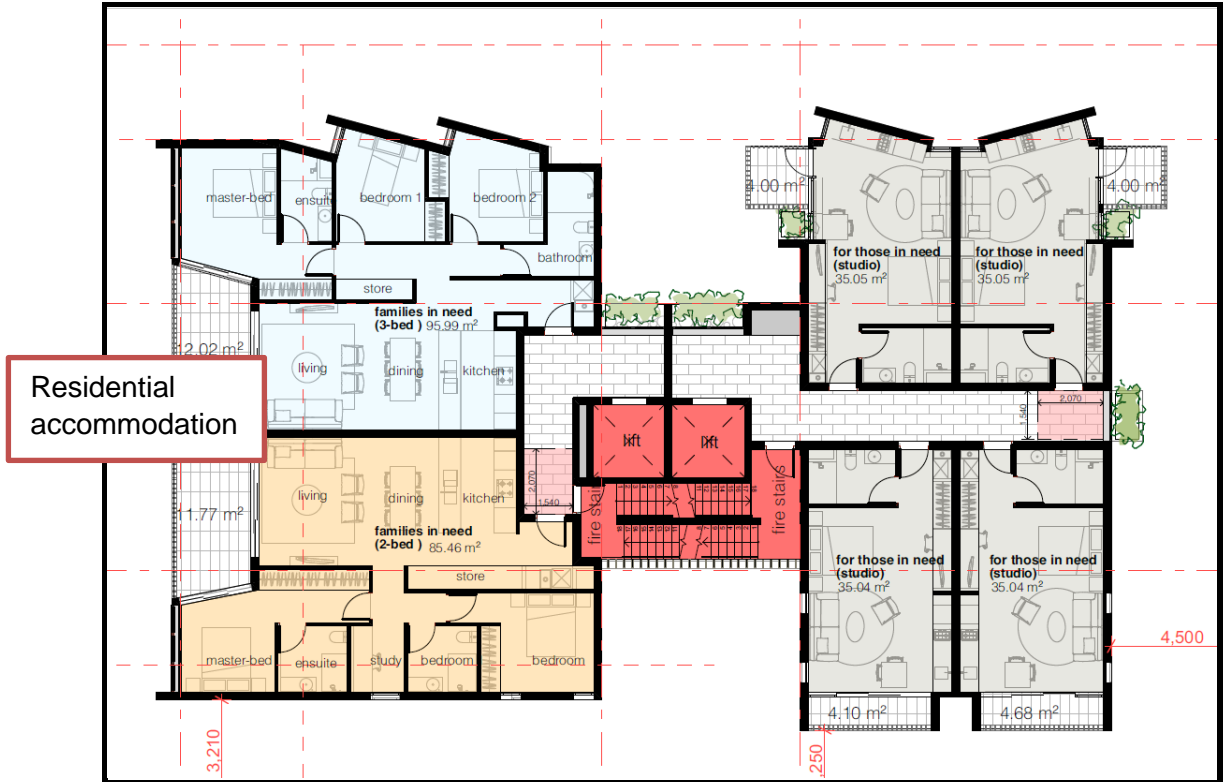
Proposed residential floor (typical) (Source: : Integrated Design Group, September 2020)
